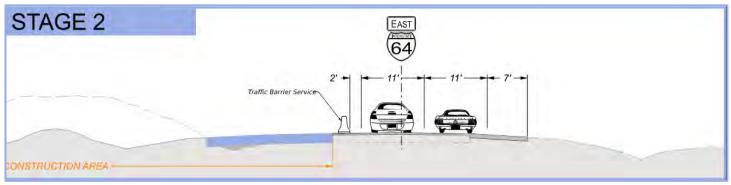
TMP Typical Sections, Stage 2
